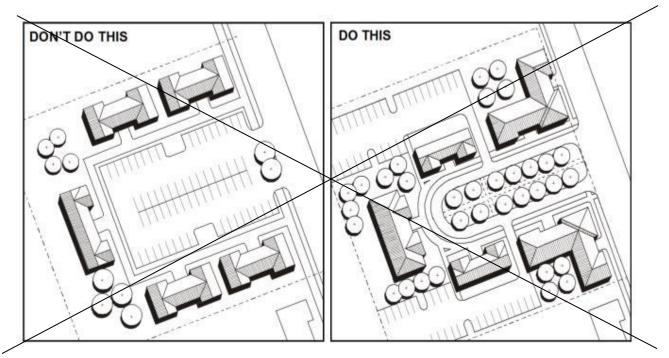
(E): Examples of breaking up parking and siting it behind buildings. Such development creates an attractive open space and avoids the impact of a large central parking lot.
